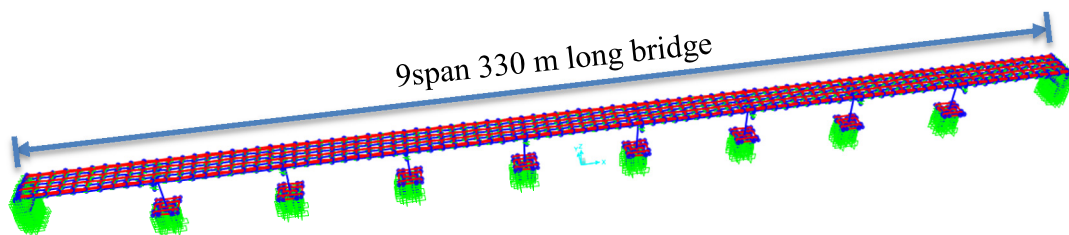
3D bridge model in SAP2000 founded on medium stiff clay
